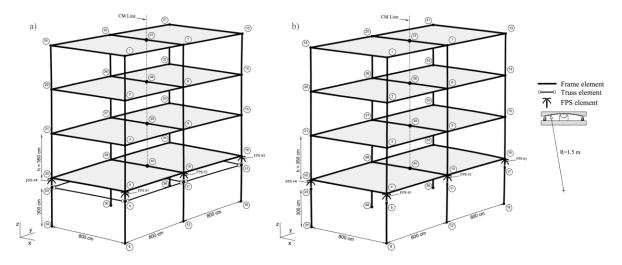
Base-isolated structure configurations with(a) and without(b) the beams connecting the substructure columns.
